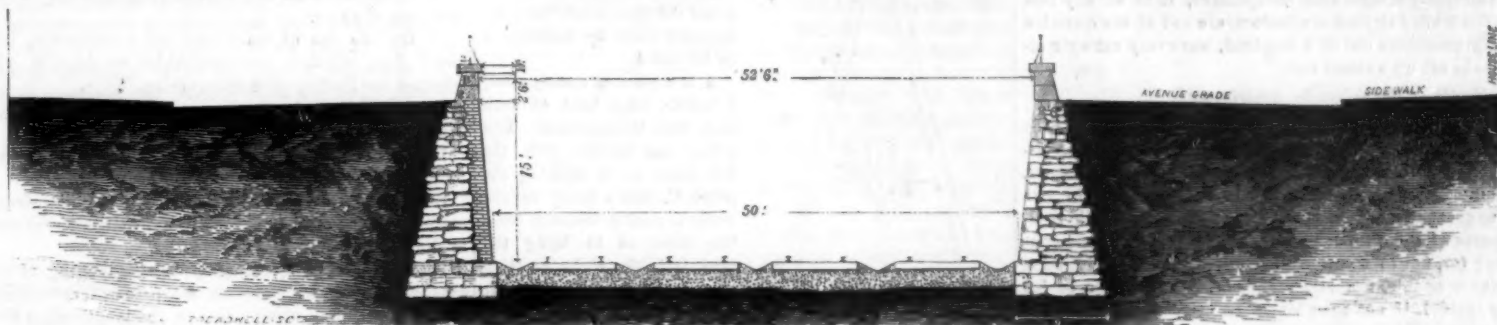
THE UNDERGROUND RAILWAY IN NEW YORK. CROSS SECTION OF THE OPEN CUT ON FOURTH AVENUE.
